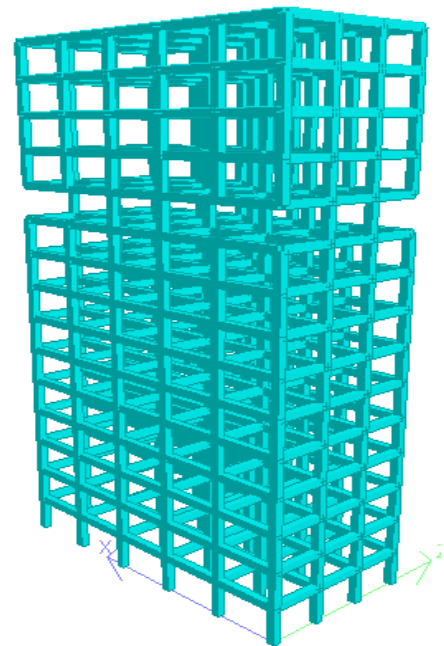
Isometric view of building showing floating column in G+9 floor level.
